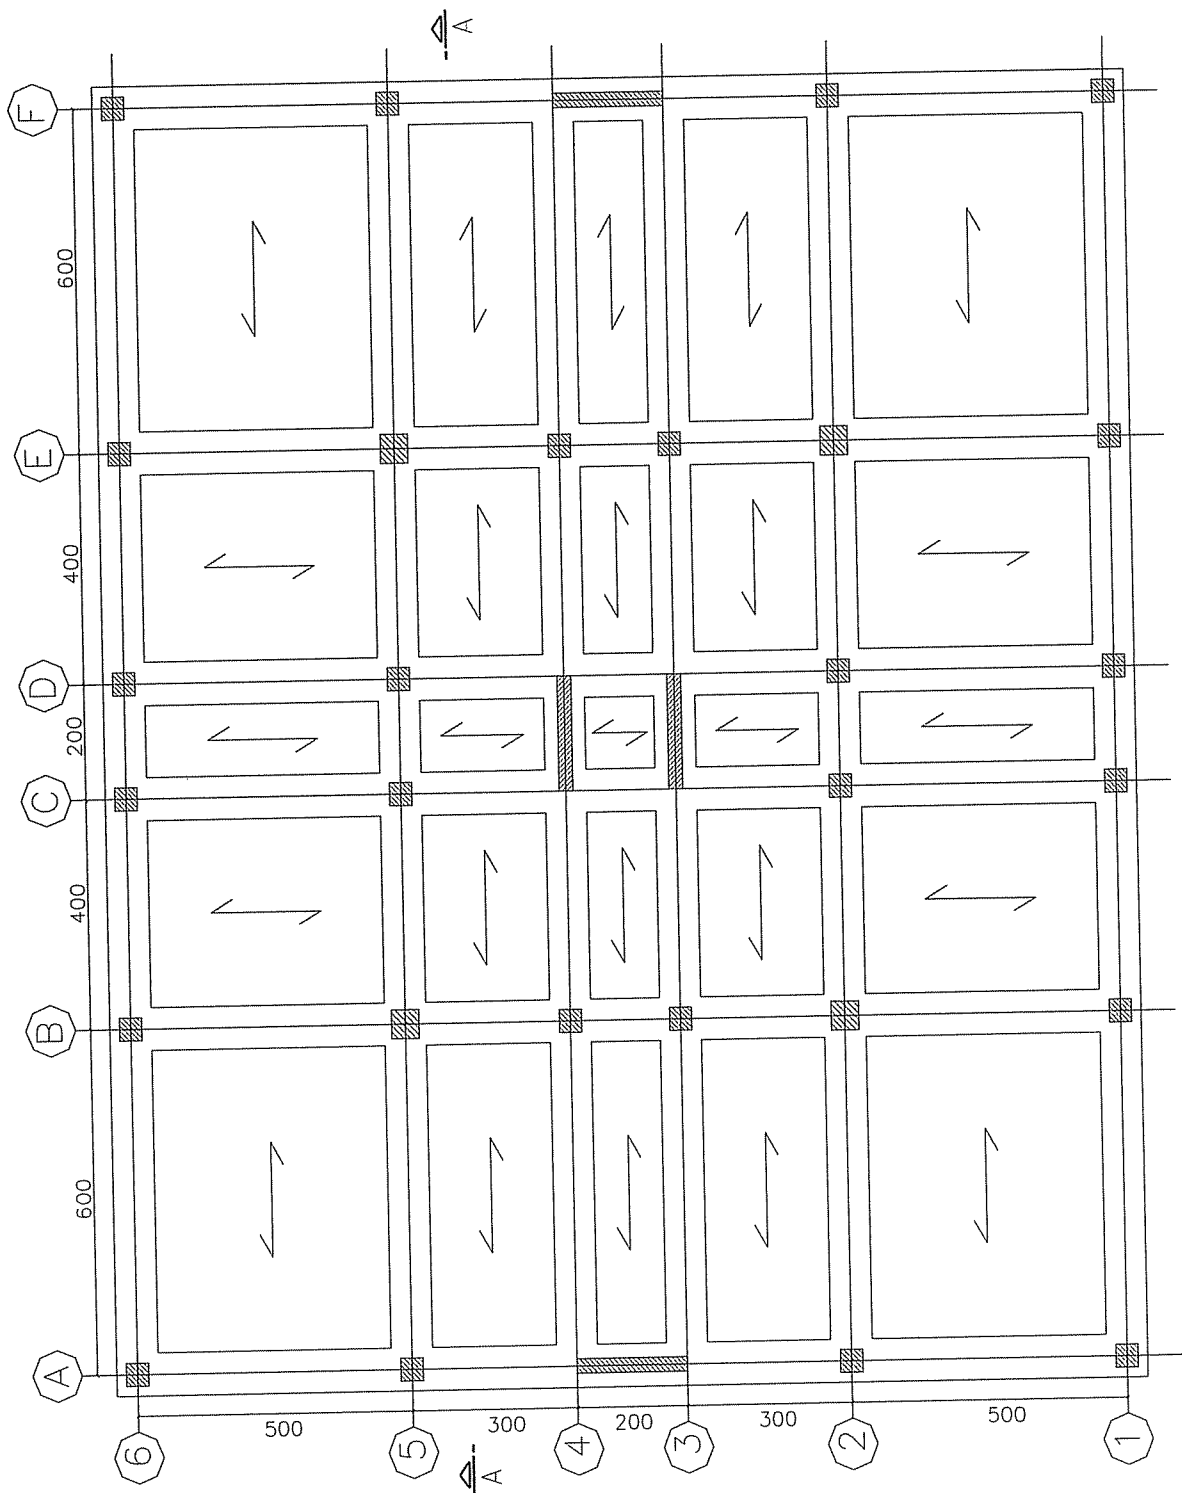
Floor plan of six-storey R.C. wall-frame system with the same story height.
